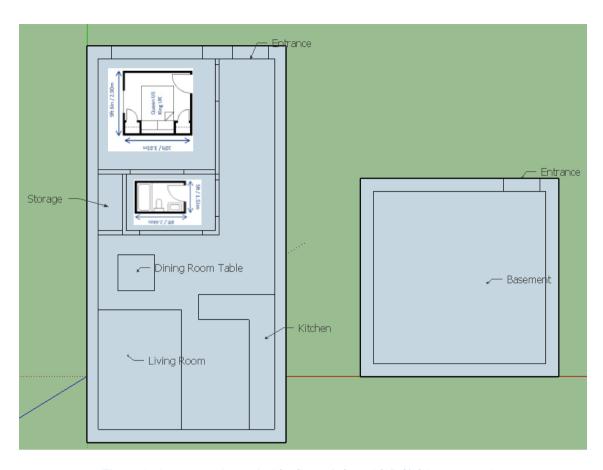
Apartment plan typical for floors 1, 2, and 3 (left) & basement plan
